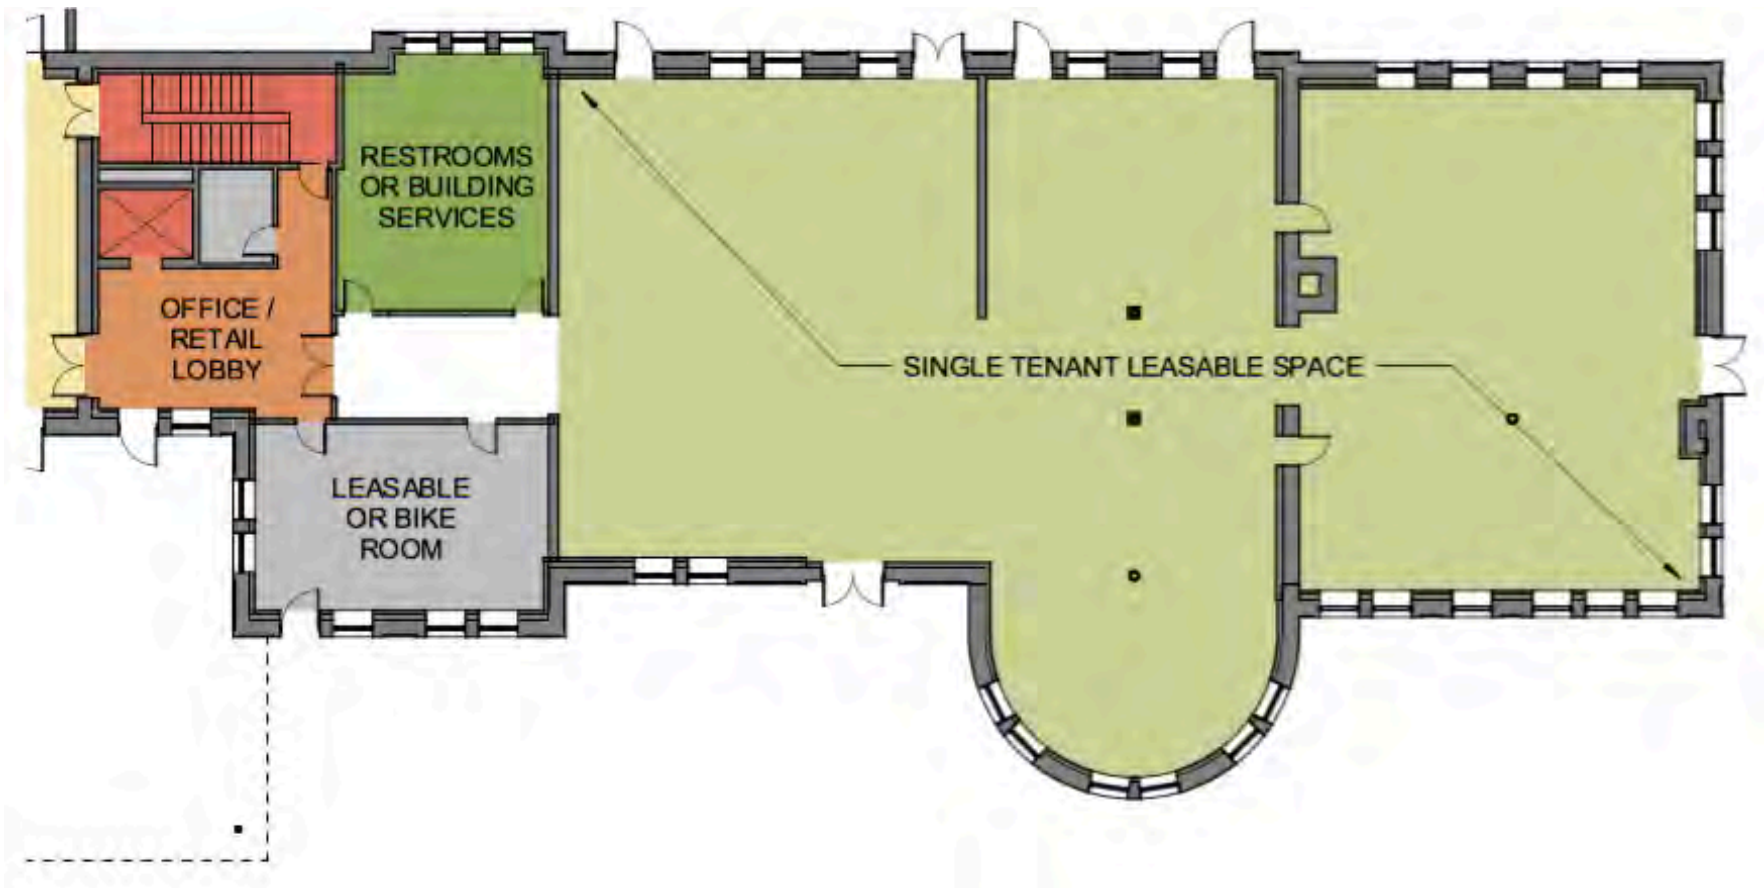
South Main Floor Leasable Spaces Alternative D - Market Hall
